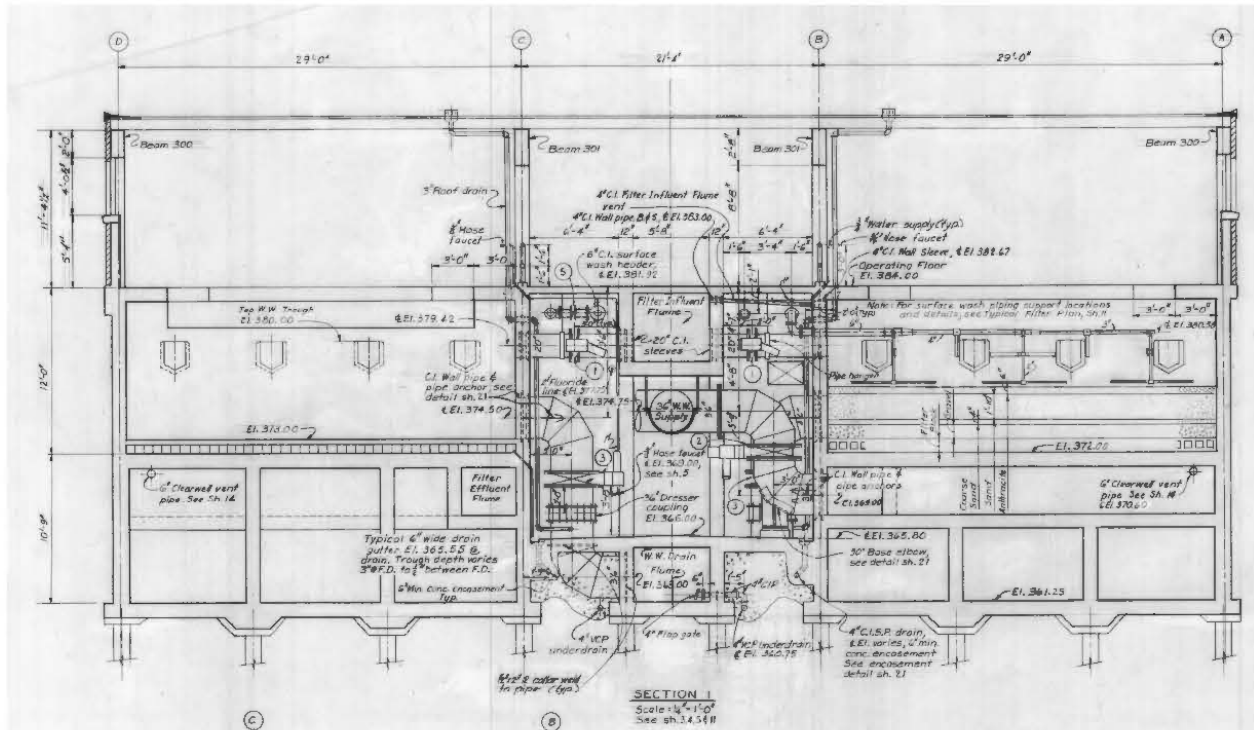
South Plant Filters 21-28 Section View (existing)
